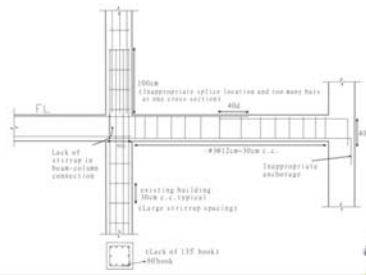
Critical Structural Details - RC Frame Reinforcement Details
